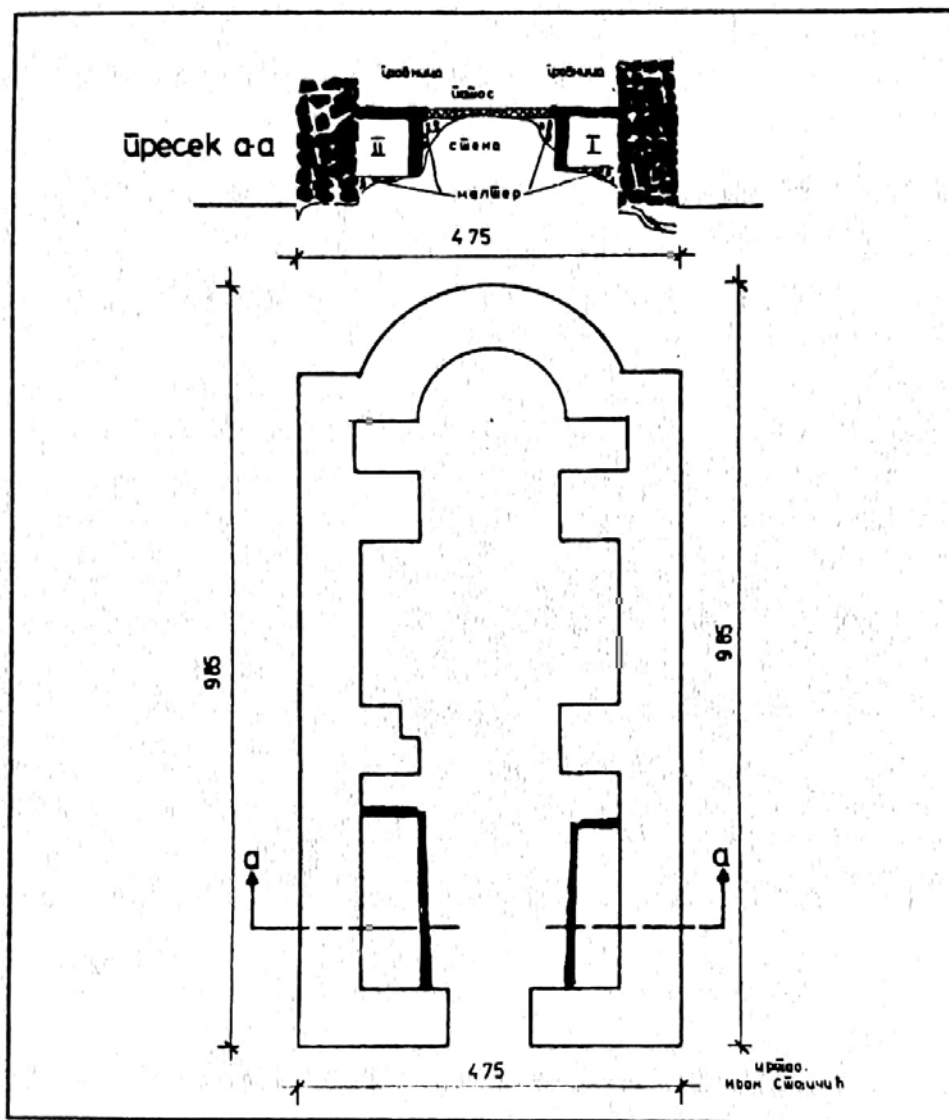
Church ground plan on the Gradac site near Krepoljin according to M. Cunjak and M. Miljković (according to: Цуњак и Миљковић 1993: 68, Fig. 1).
